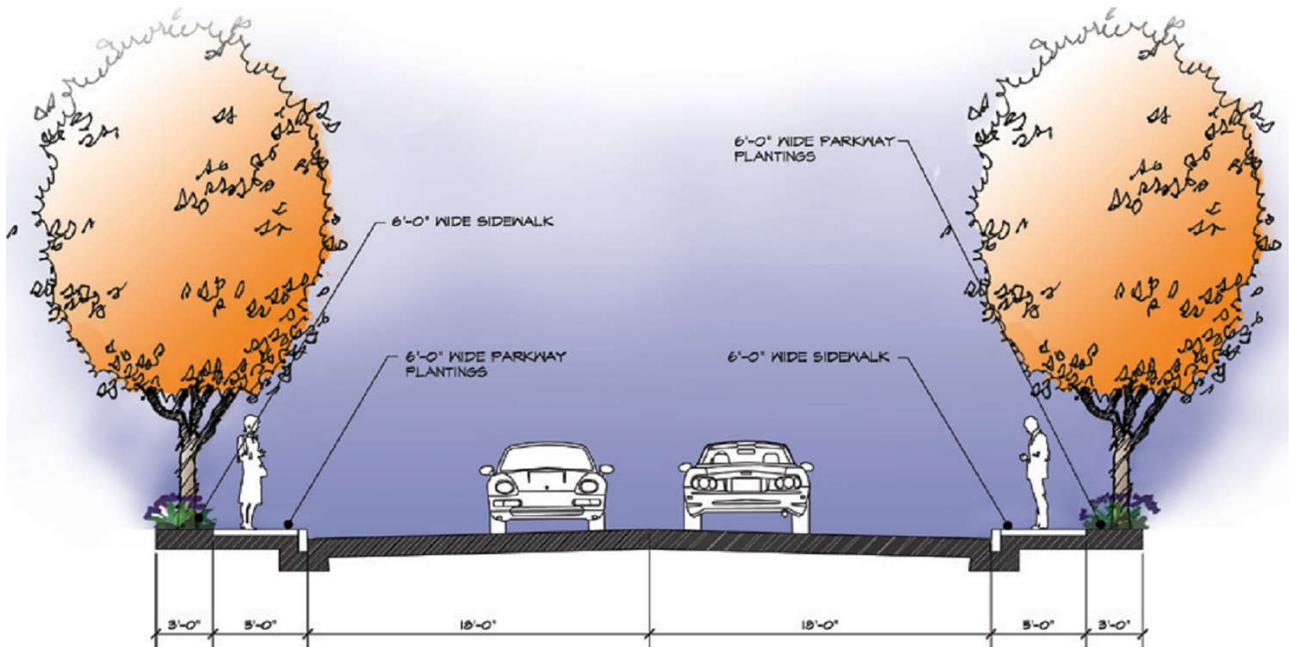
CONCEPTUAL CENTRAL GREEN PARKWAY PLAN
